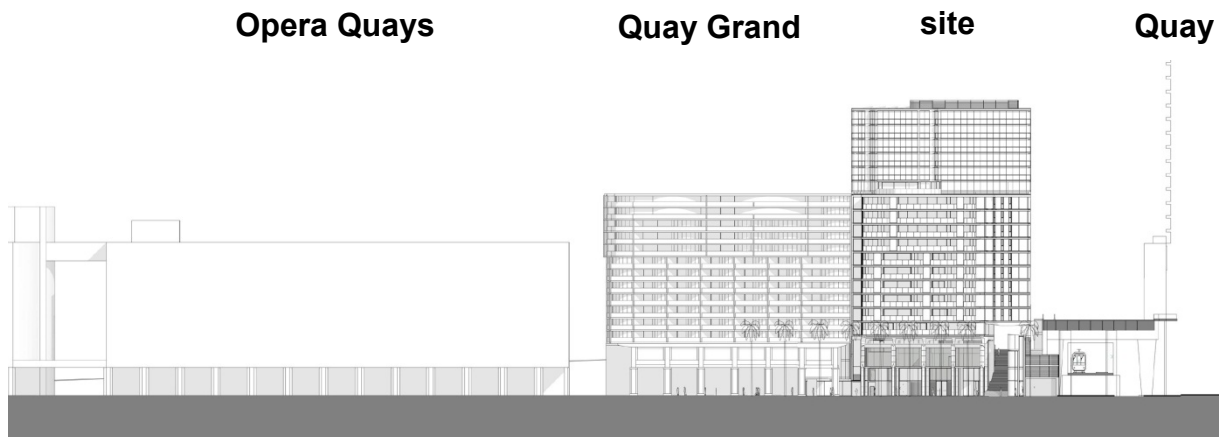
Context elevation illustrating the scale of existing buildings along East Circular Quay.
